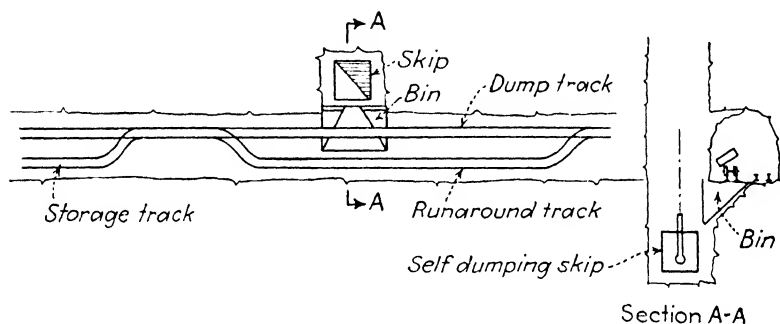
Typical double-heading track layout at foot of shaft for skip hoisting.
